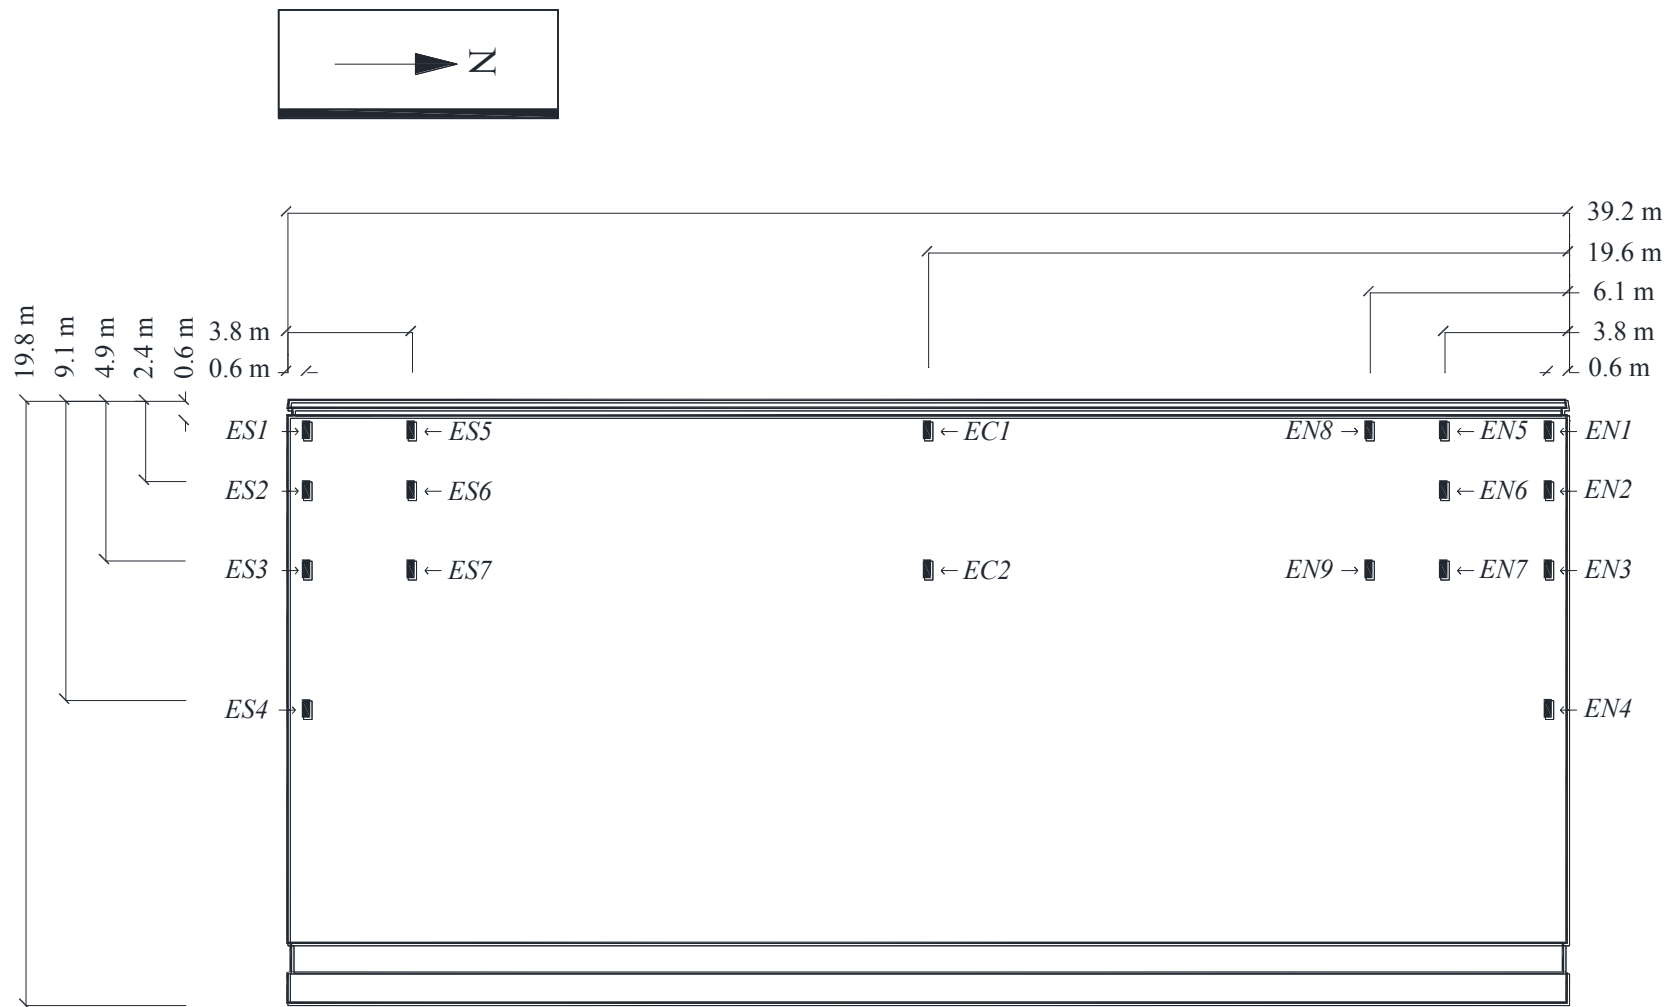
Side view of the east facade and the WDR gauge locations.
